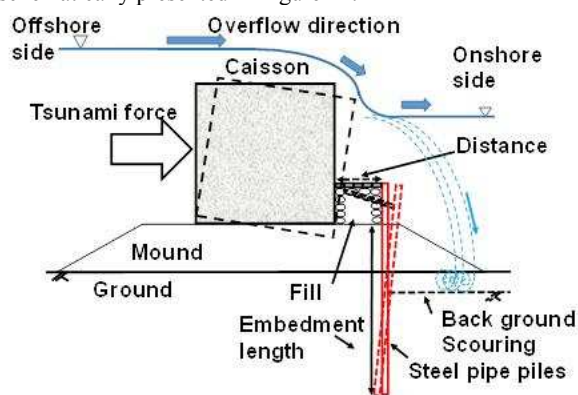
Schematic of the reinforced gravity-type composite breakwater with steel piles, after Kikuchi et al. (2017)
